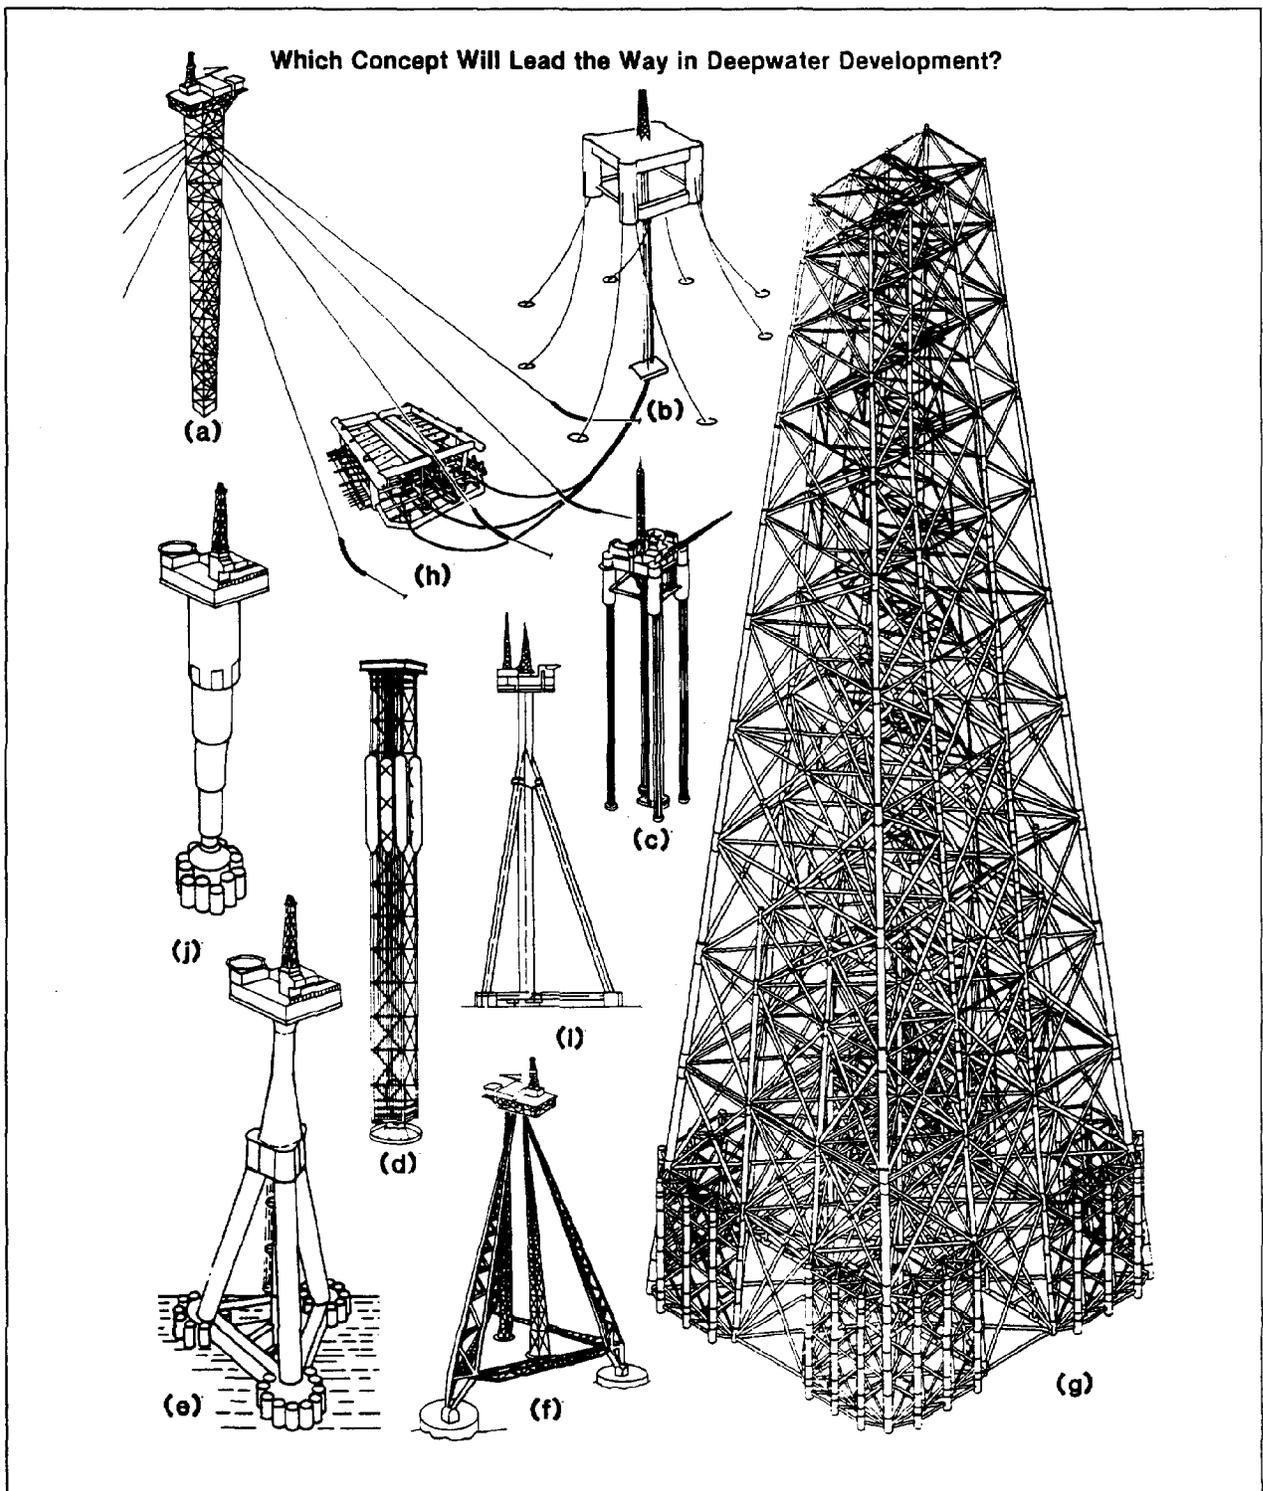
Structural concepts for deepwater platforms: (a) Guyed Tower, (b) Floating Production System, (c) Tension Leg Platform, (d) Articulated Compliant Tower, (e) Rigid Concrete Tripod Structure, (f) Steel Tripod Structure, (g) Rigid Steel Jacket, (h) Subsea Production System, (i) Steel Box Tripod Structure, (j) Solid Compliant Tower (figure courtesy of McDermott International).
